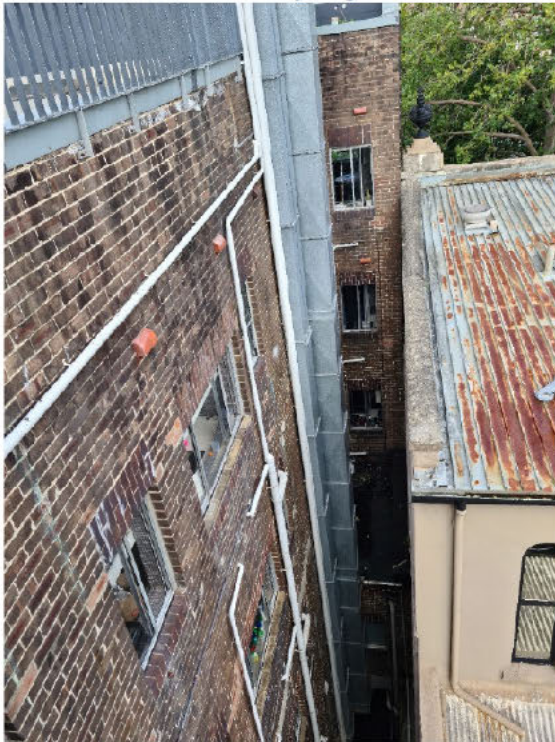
View to the east of south facing windows of 167Vic noting the level of windows relative to 169Vic boundary wall
